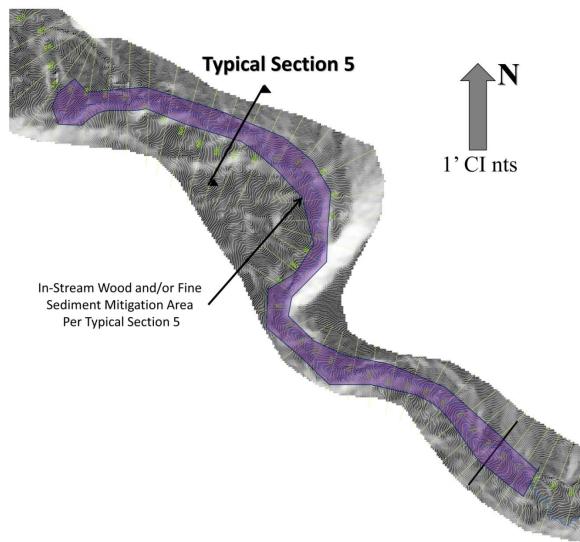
Site map of Zone 2 along Lulu Creek upstream from the footbridge showing areas of wood and sediment mitigation, and location of a typical section. Black bold line in purple polygon is a footbridge. (nts is "not to scale")
